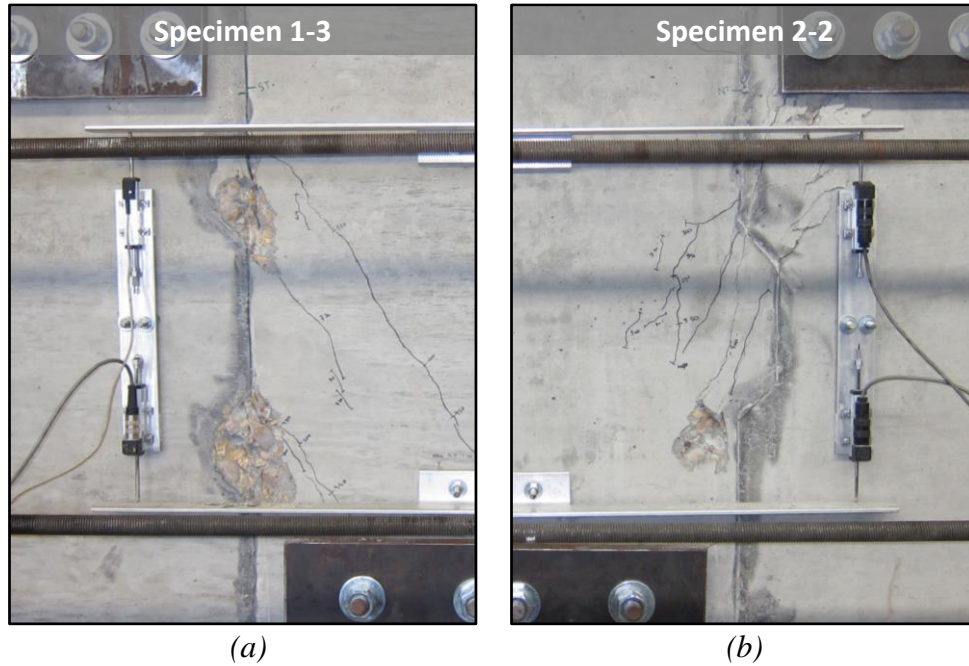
Failed interfaces – (a) Specimen 1-3; (b) Specimen 2-2
